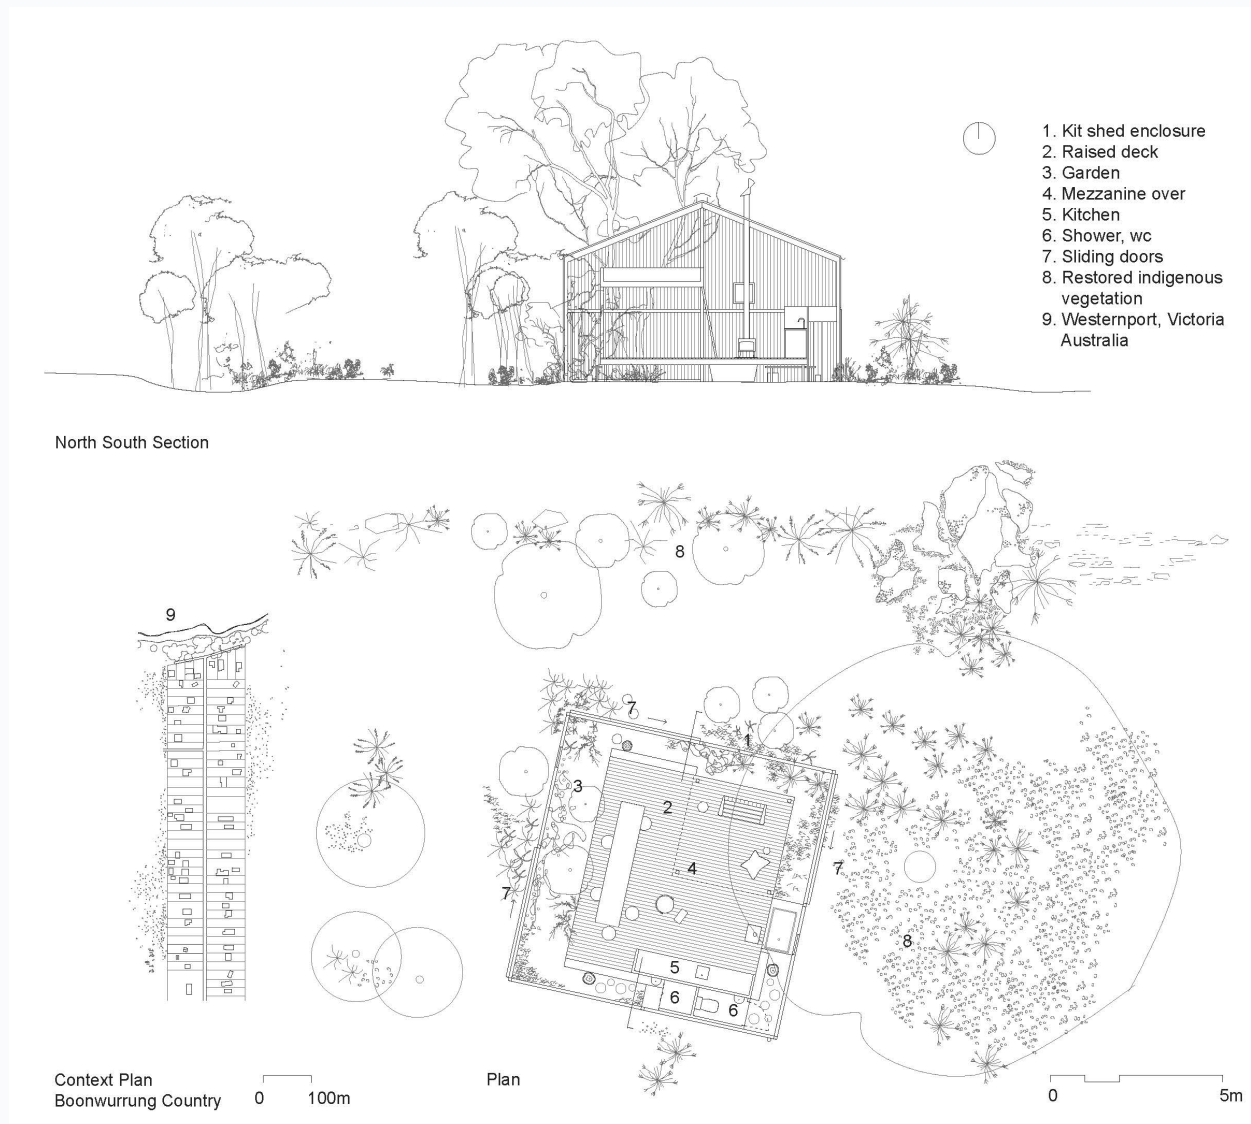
Garden House by Baracco and Wright Architects site plan. The house is located in a space within the property that was vacant and where water accumulated. Raised stilts allow for ongoing continuity of the landscape at a site scale. (Image: Baracco and Wright Architects)
